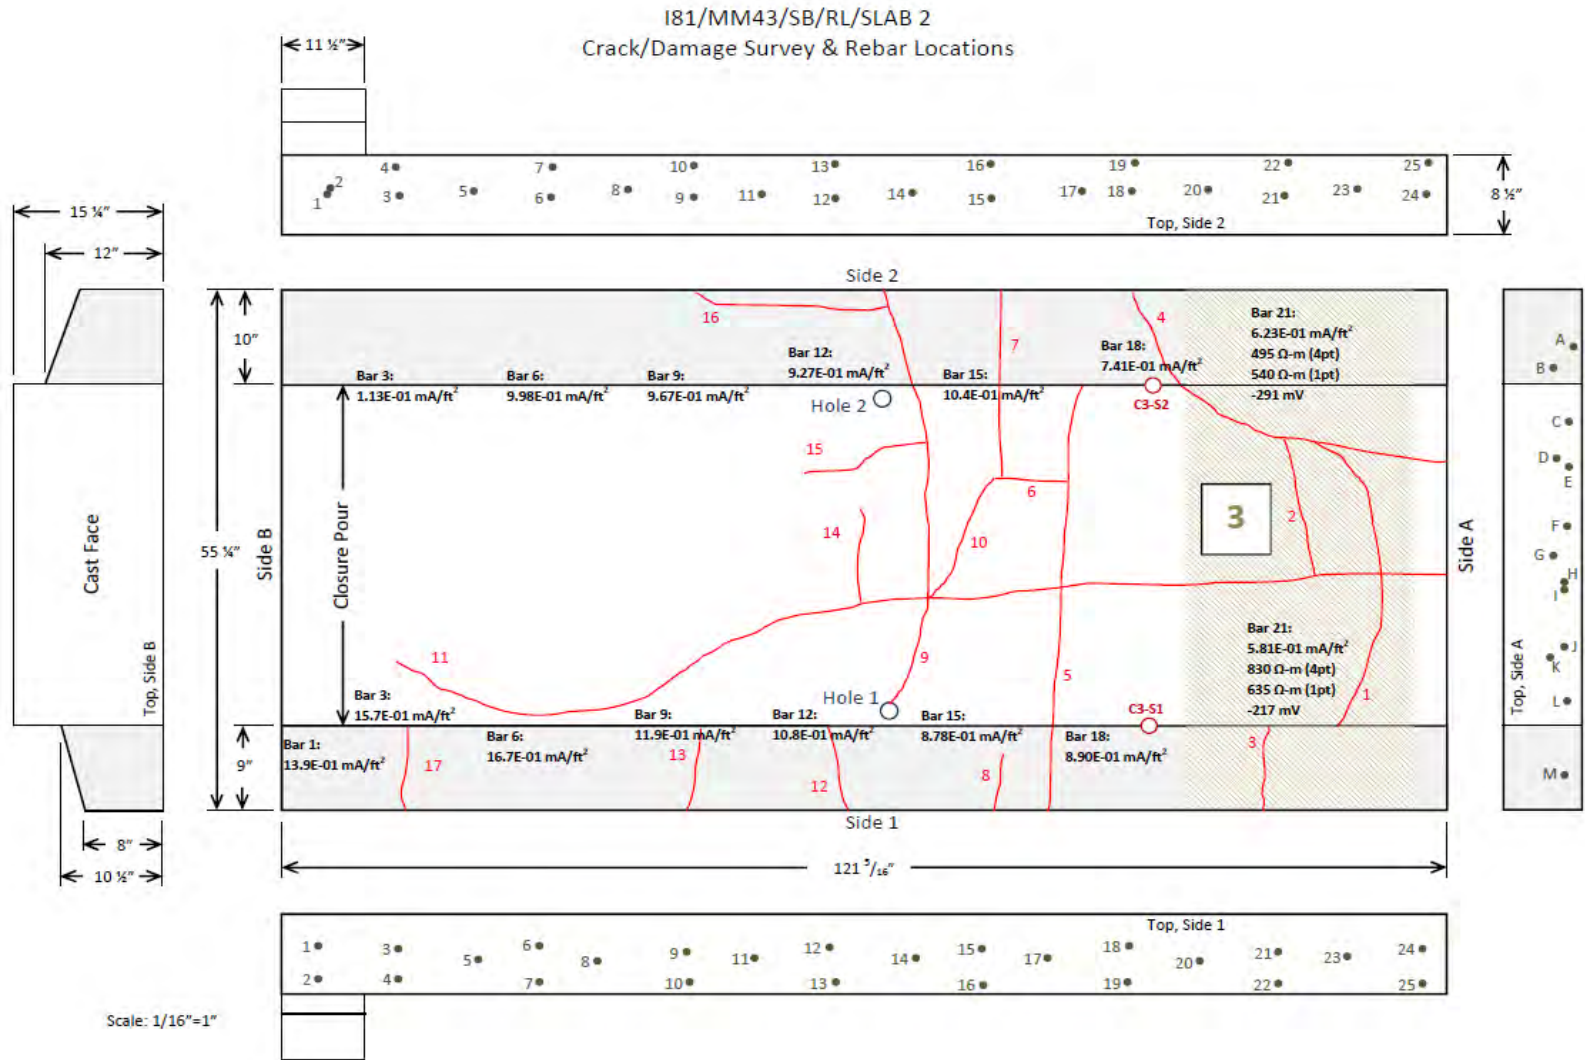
Crack, Damage Survey, and Rebar Locations for Slab 2
